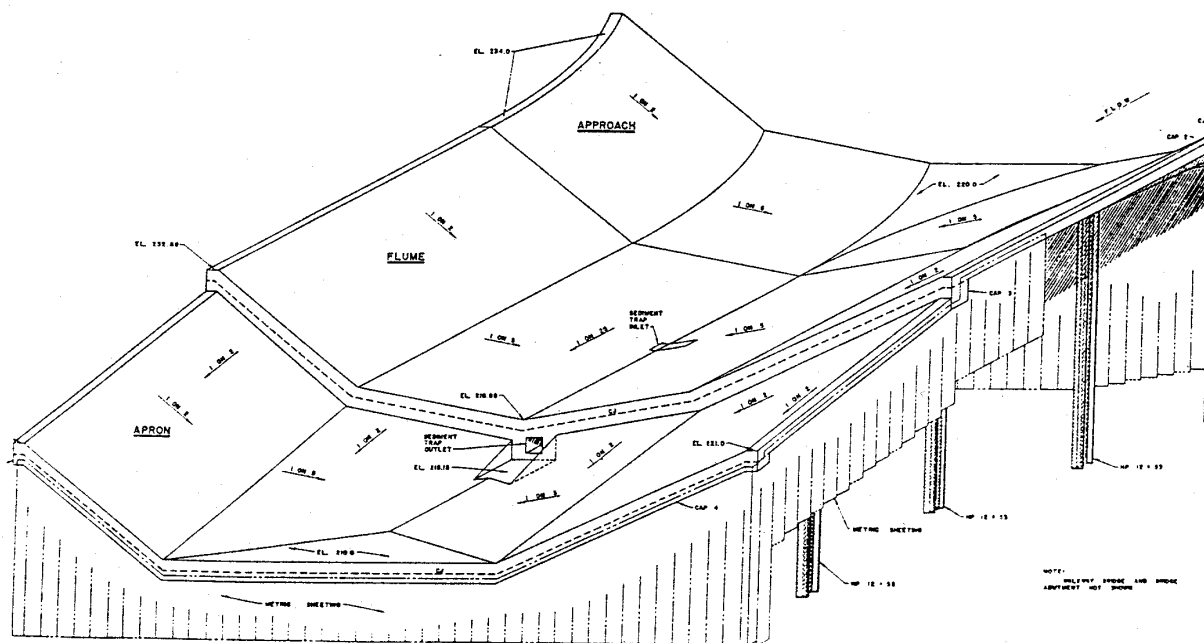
Isometric diagram of typical U-shaped compound-slope concrete flume floor
